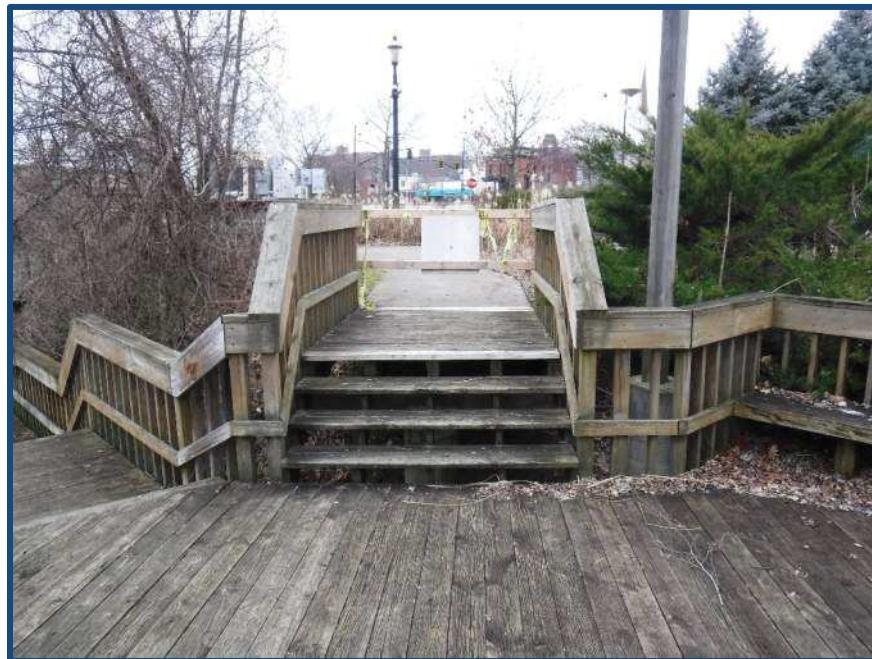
### PHOTOS OF EXISTING BOARDWALK ACCESS POINTS
